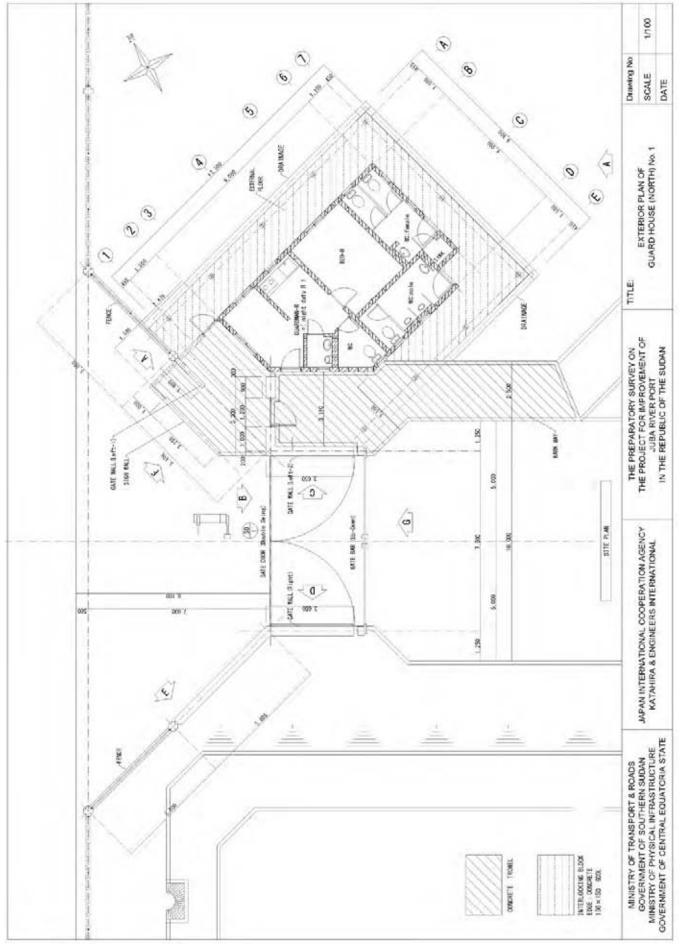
Ground Floor Plan of Guard House (North)
